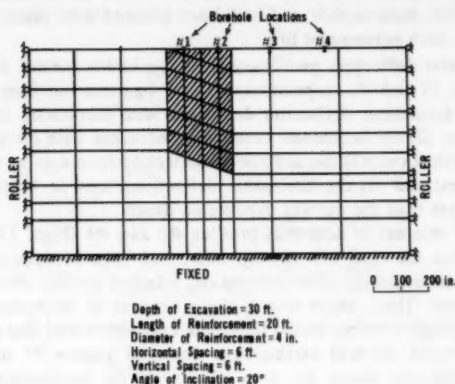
Finite Element Grid—Excavation Davis Site (1 ft = 0.305 m; 1 in. = 25.4 mm)
